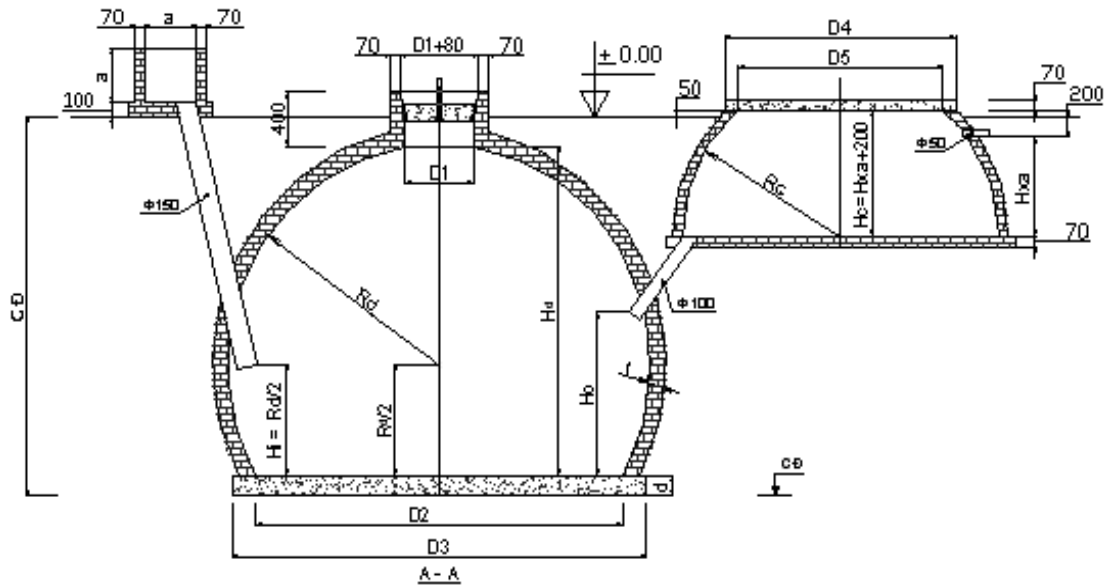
Main dimensions of fixed dome biogas plant KT1
